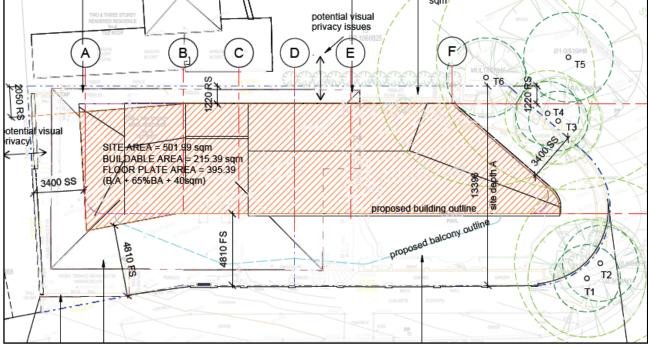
Applicant's determination of permissible setbacks. Source: Submitted Architectural Plans
